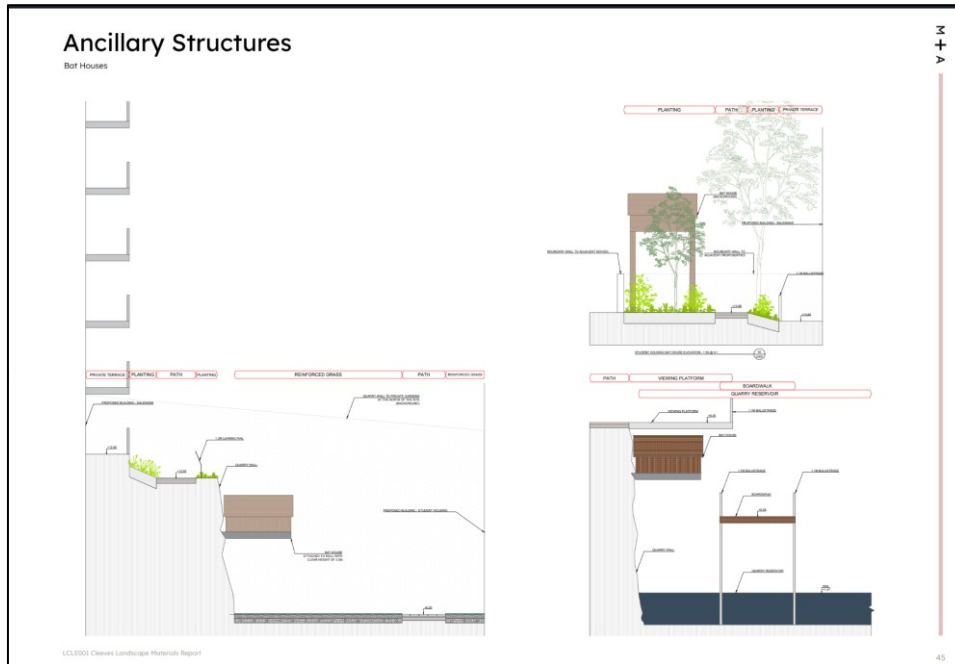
Extract from LCLE001 Landscape Plan showing proposed bat houses
